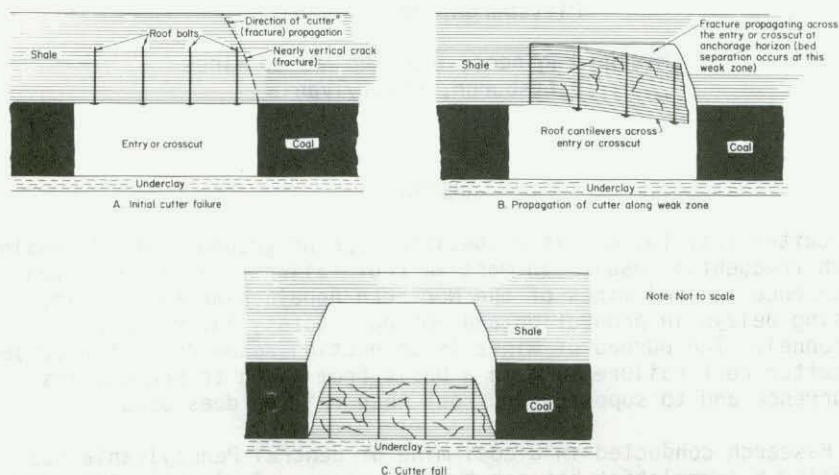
Cutter roof failure diagram (modified from Kripakov, 1982; Nichols, 1978; Stefanko, 1983).
